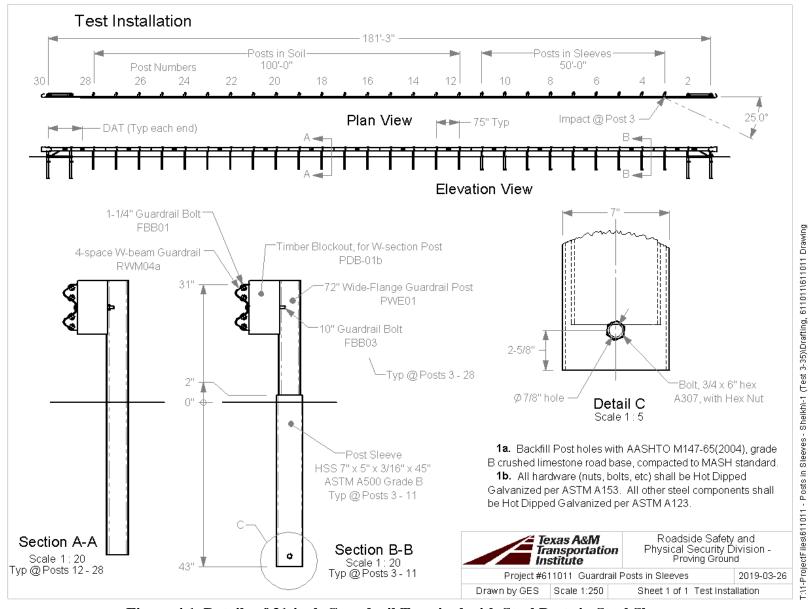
Details of 31-inch Guardrail Terminal with Steel Posts in Steel Sleeves.
